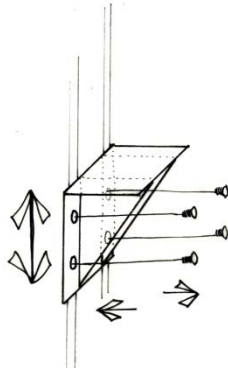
Attachment steel piece moving on the wall to adjust spacing
